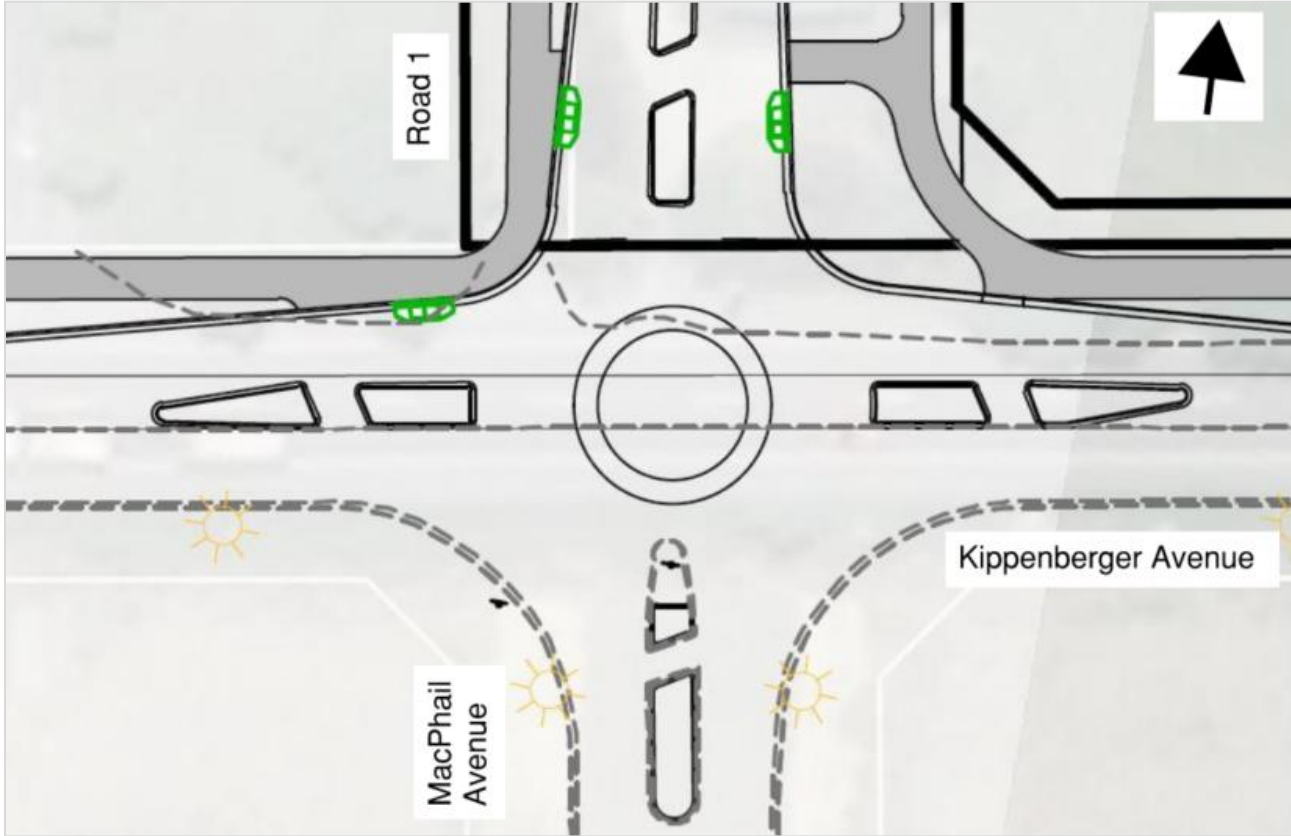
Proposed Intersection Layout Road 1 / Kippenberger Avenue / MacPhail Avenue
